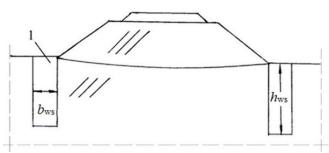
Diagram of reinforcing embankment footing on weak soils: 1 – reinforced soil; b_{ws} is the width of the wall in the soil; h_{ws} is the reinforcement depth
